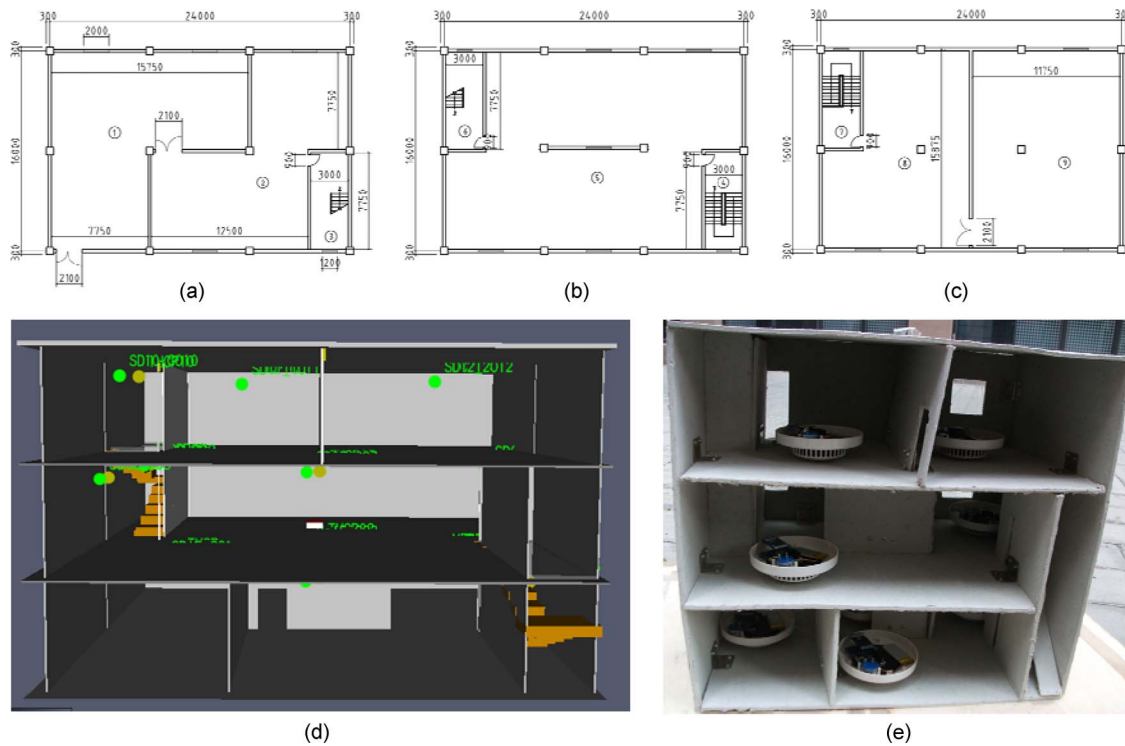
Structure of the real building model. (a) First floor structure by CAD. (b) Second floor structure by CAD. (c) Third floor structure by CAD. (d) Three-dimensional model with inner walls hidden. (e) Side view of the building model with sensors installed.
